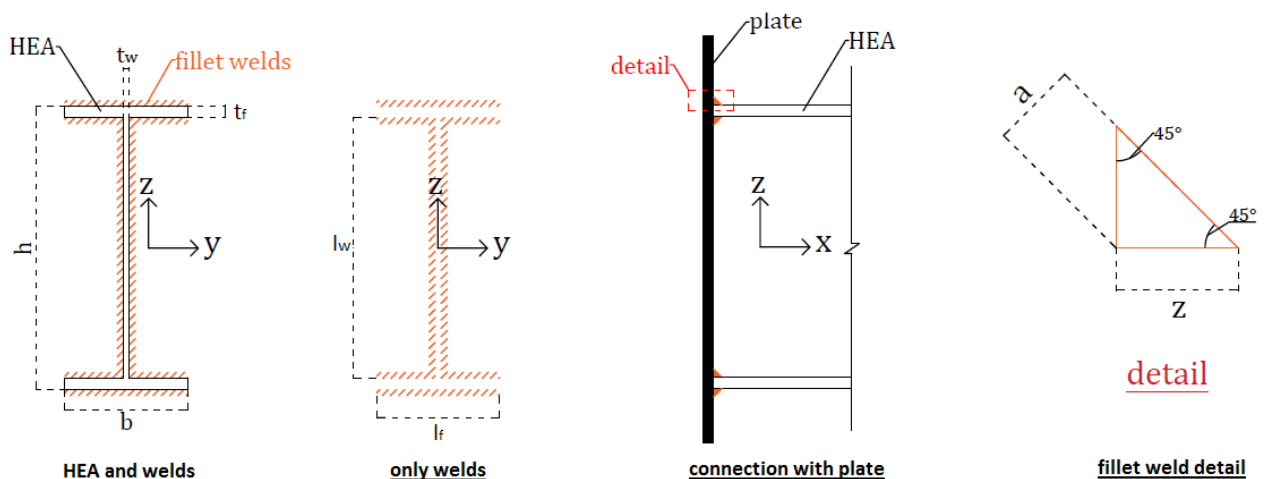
Weld attachment of HEA section to end plate
